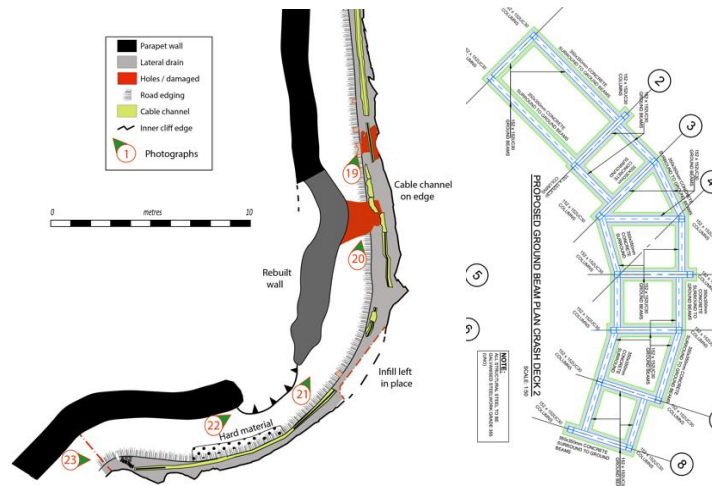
Plan of archaeological features of in area of Crash Deck 2 and proposed foundations of Crash Deck 2.
